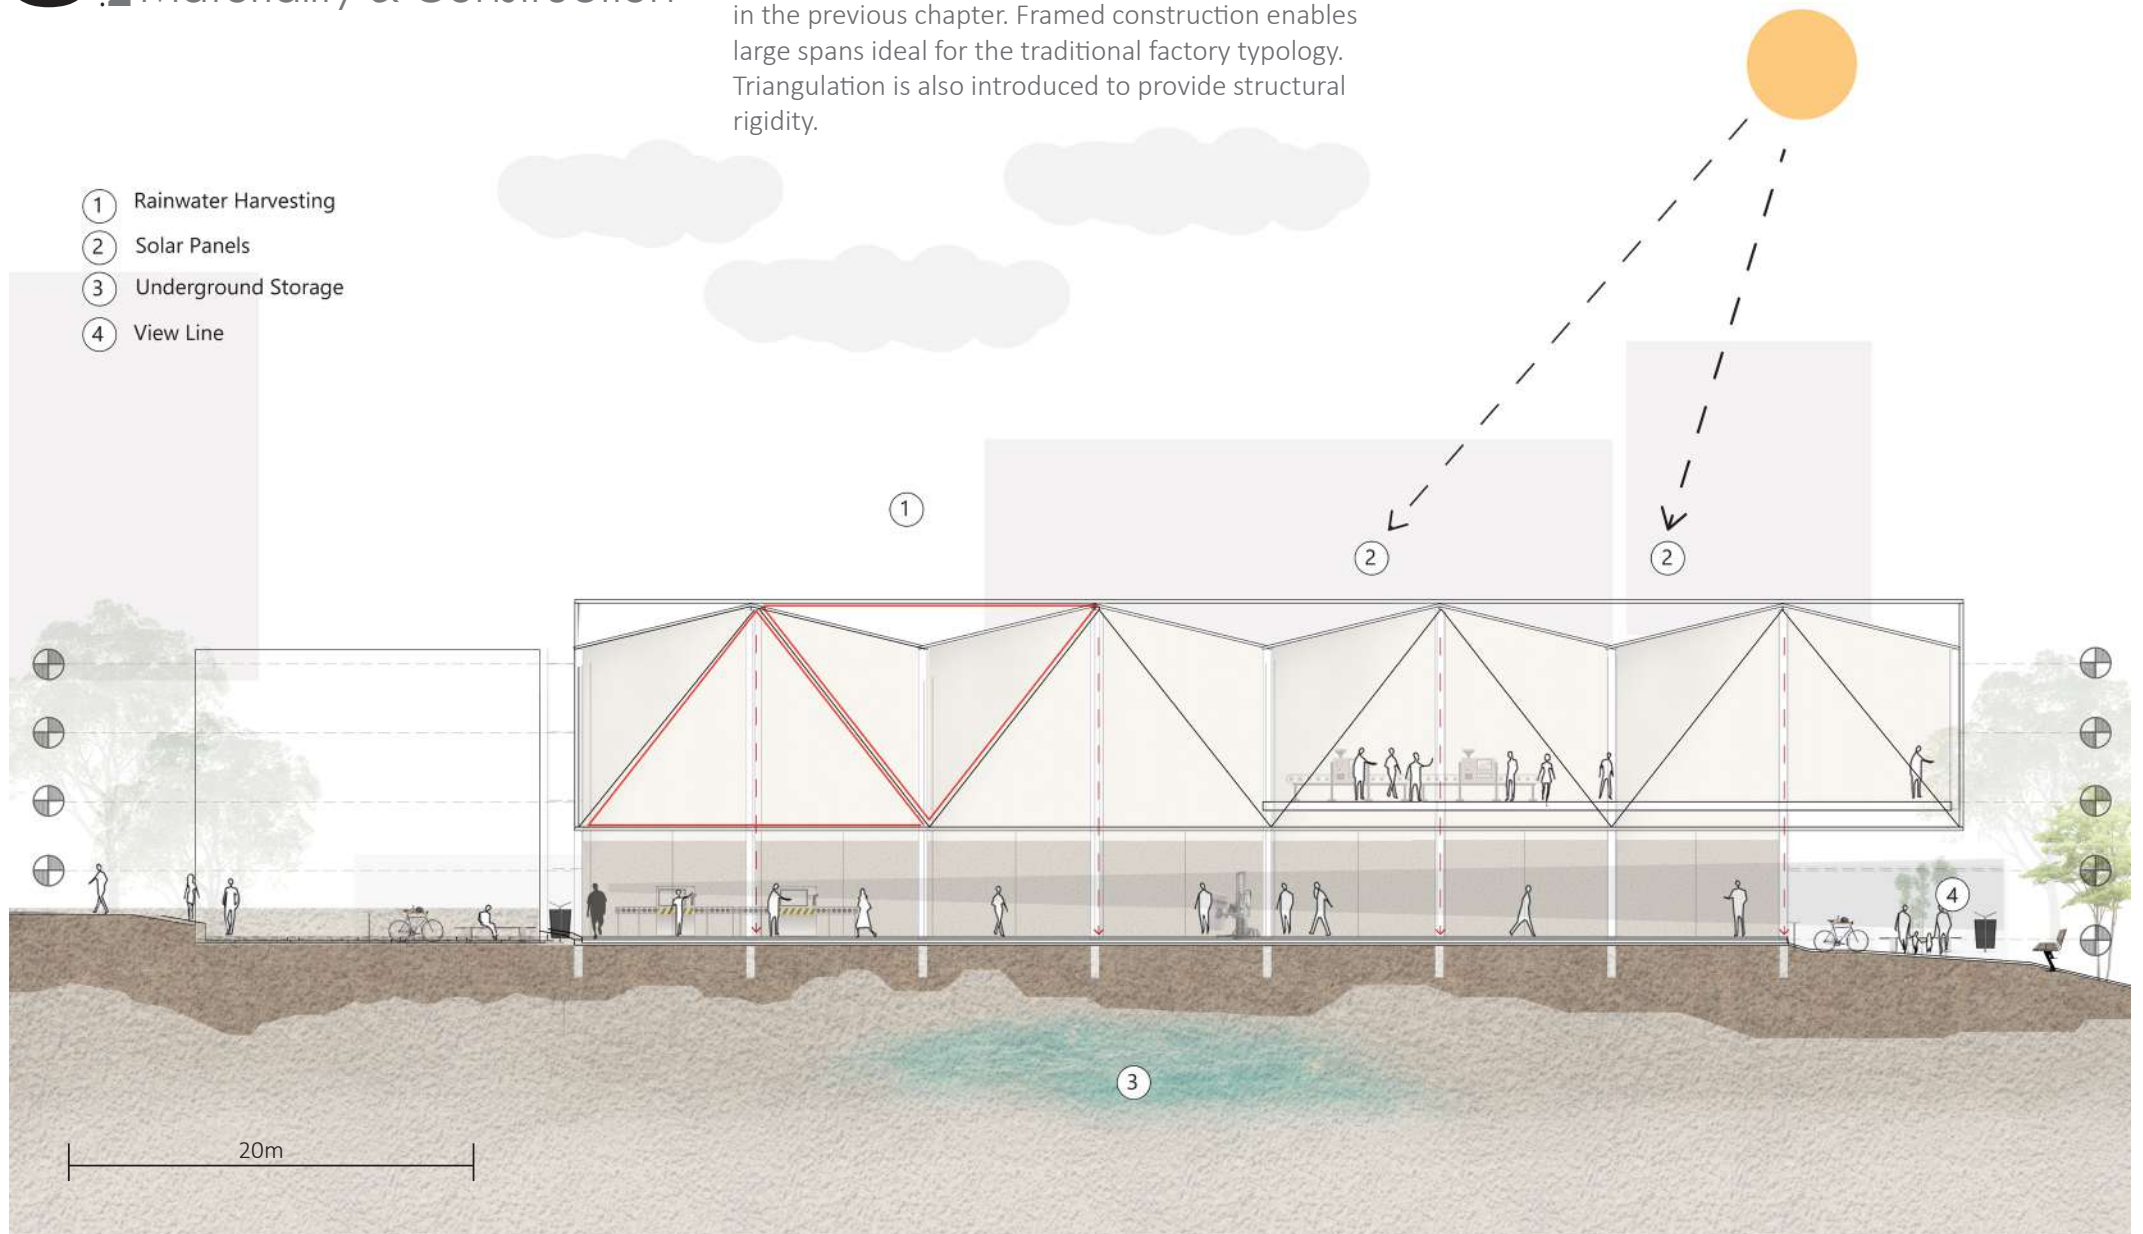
(i): Sectional Rendering Exploring Tectonics and Materiality of Design Proposal, (Author 2020).
